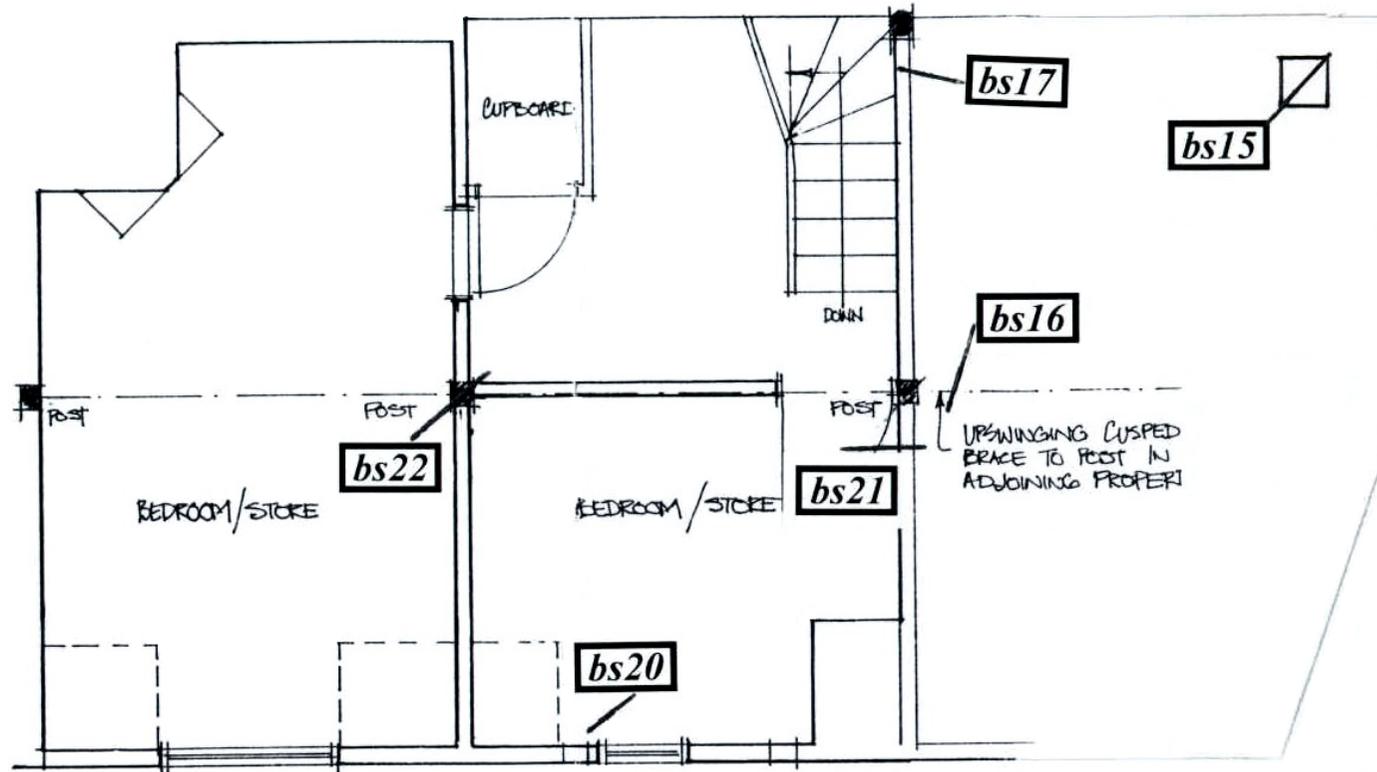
First-floor plan, showing the location of timbers sampled in Bear Steps Hall, Gallery, and The Orrel (after Moran 1989 © Shrewsbury Civic Society)
